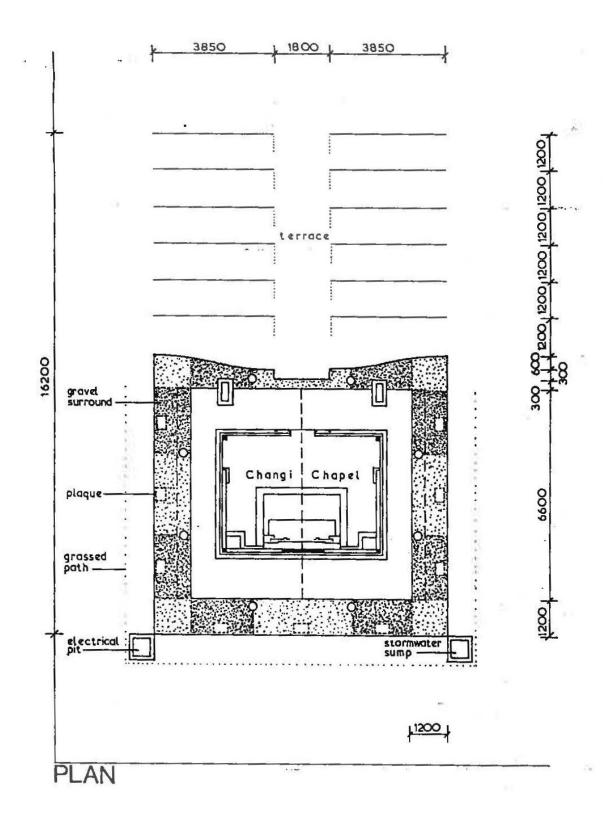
Measured site plan for Changi Chapel, 1987, showing plans for terraced landscaping in front of the Chapel. (Source: Reconstruction of Changi Chapel at RMC Duntroon, July 1987)
